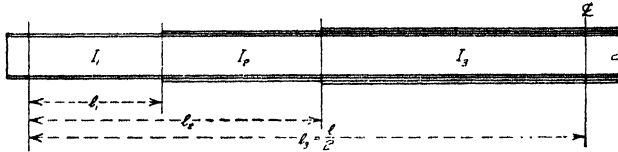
Calculation of deflection of reinforced or built-up beam.
